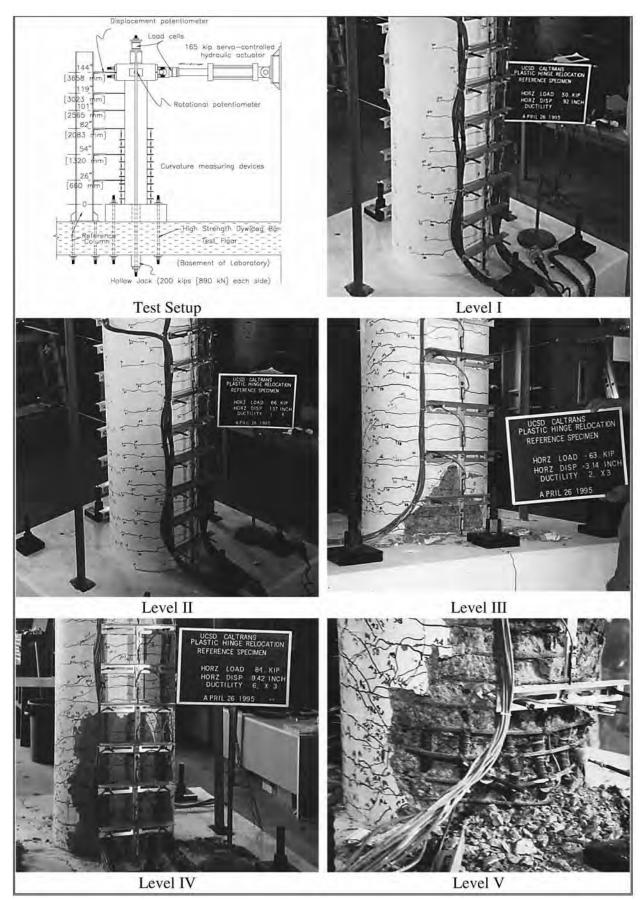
Bridge column damage at various damage levels SRPH-1 (Hose and Seible 1999).
